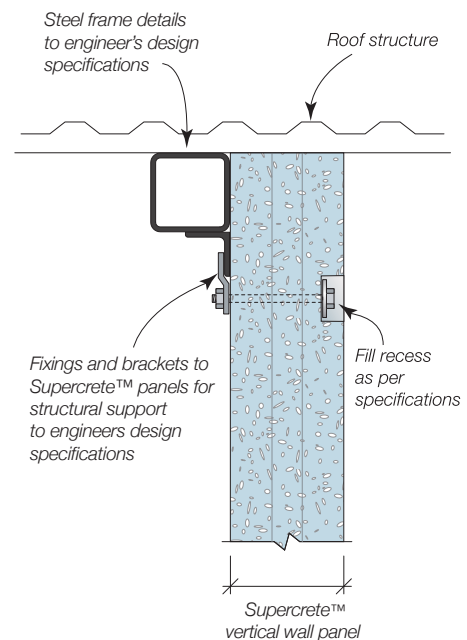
Vertical wall panel & concrete support structure top of wall junction detail.
